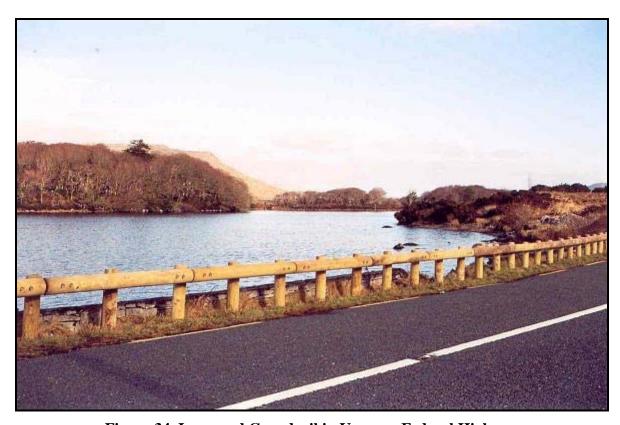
Ironwood Guardrail in Use on a Federal Highway
